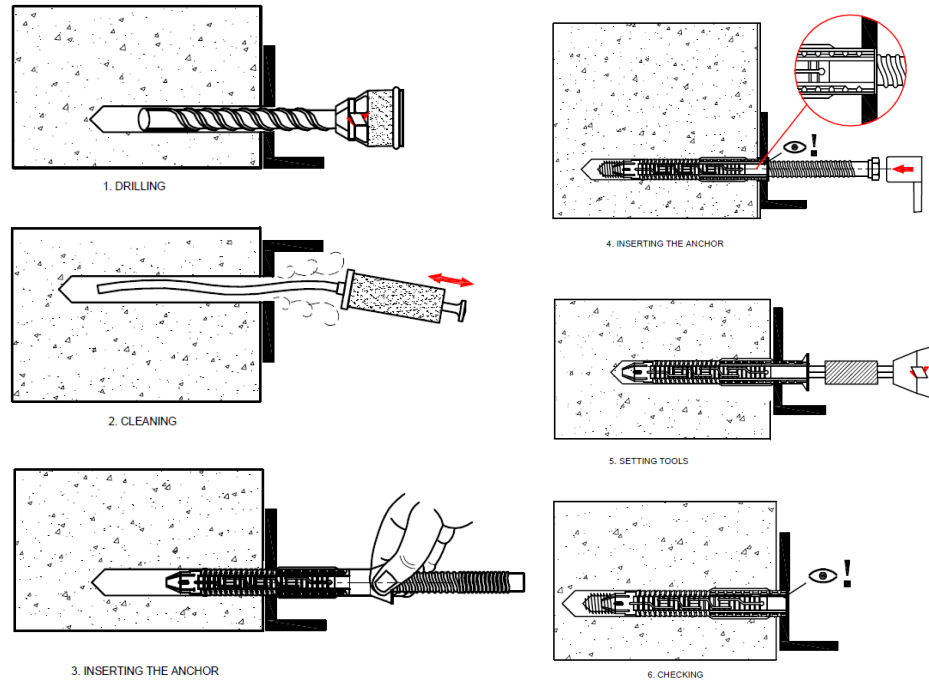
INSTALLATION INSTRUCTION FOR EXPANSION PLUG ANCHORS
